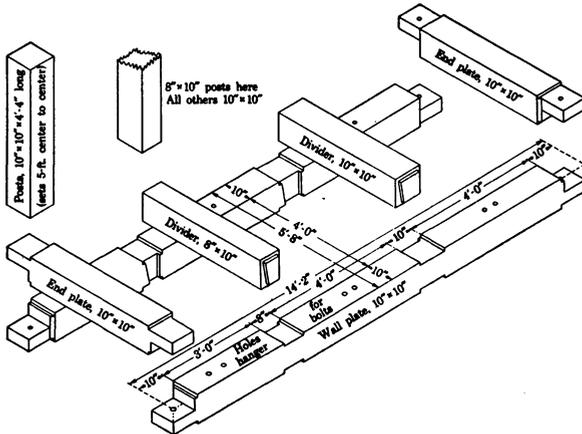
Shaft set, Magma mine. (All daps, 1 inch; corners fastened with wooden dowel pins)
